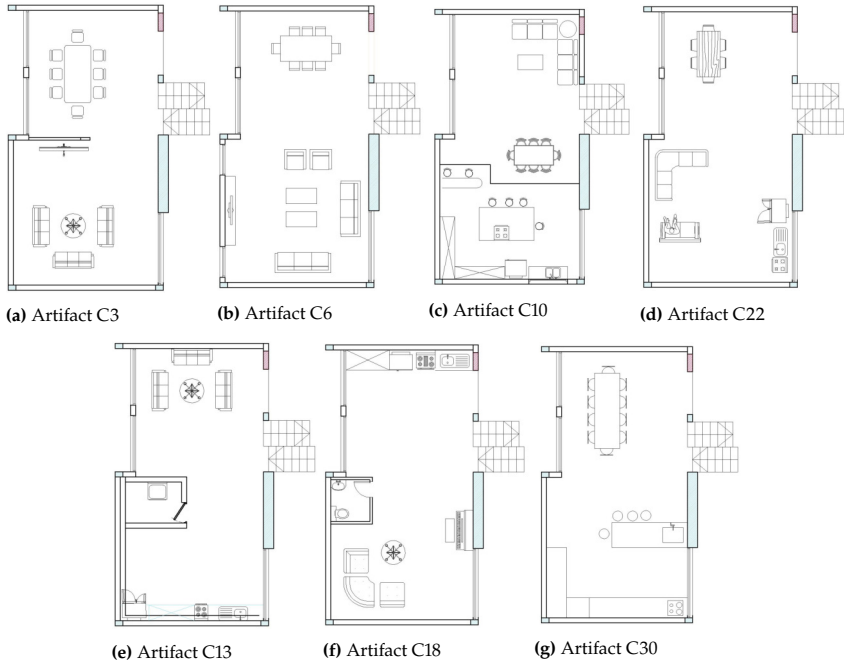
Level 1 plan artifacts (Experiment 14)
